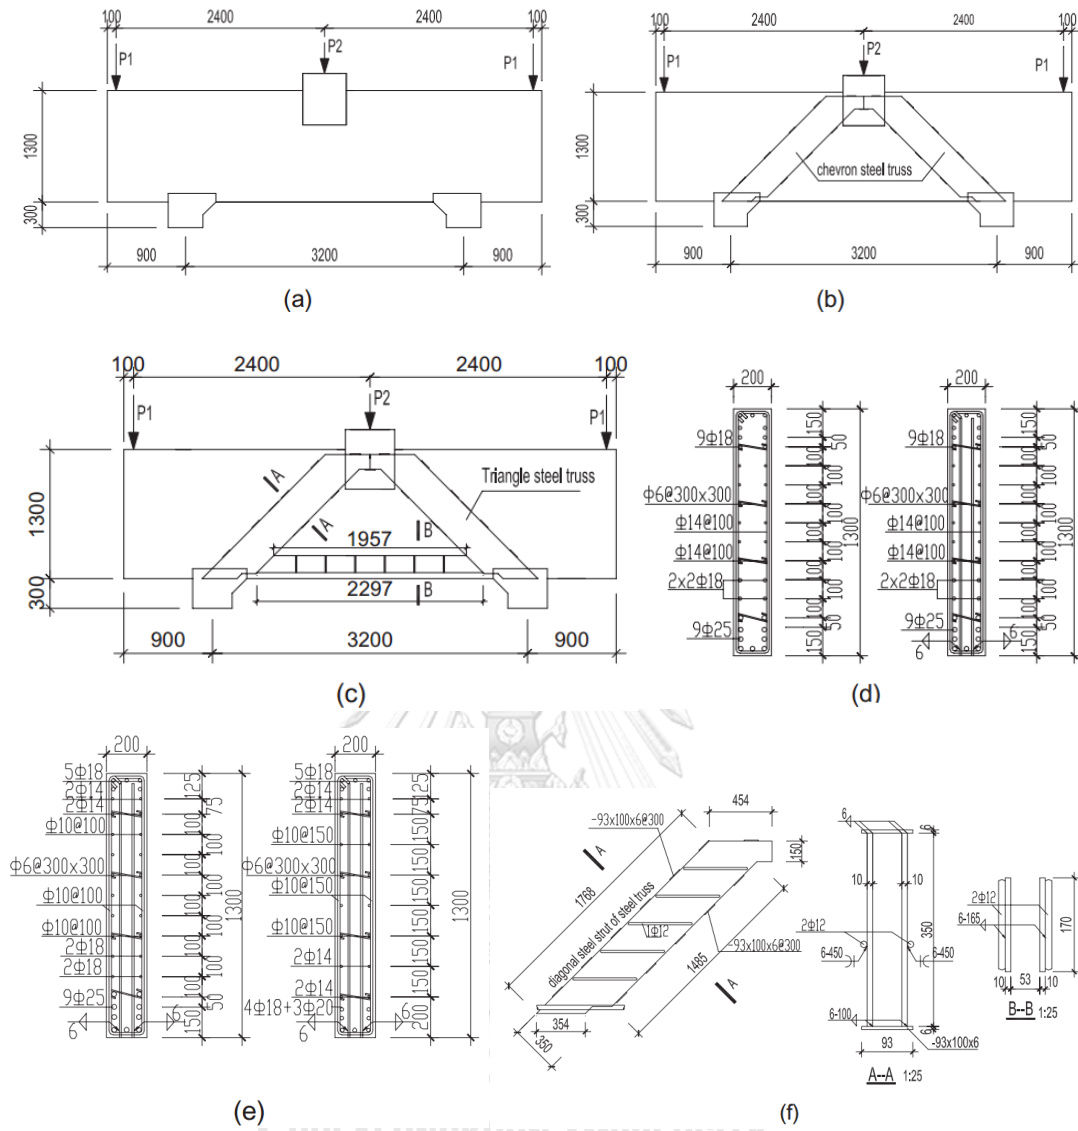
Design configuration of the specimens (mm) (Wu et al., 2011)
